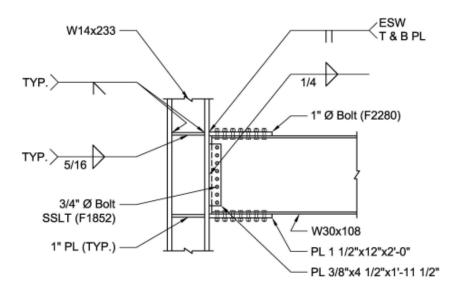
Moment connection details for the specimen No. BFP (Sato et al., 2007)
